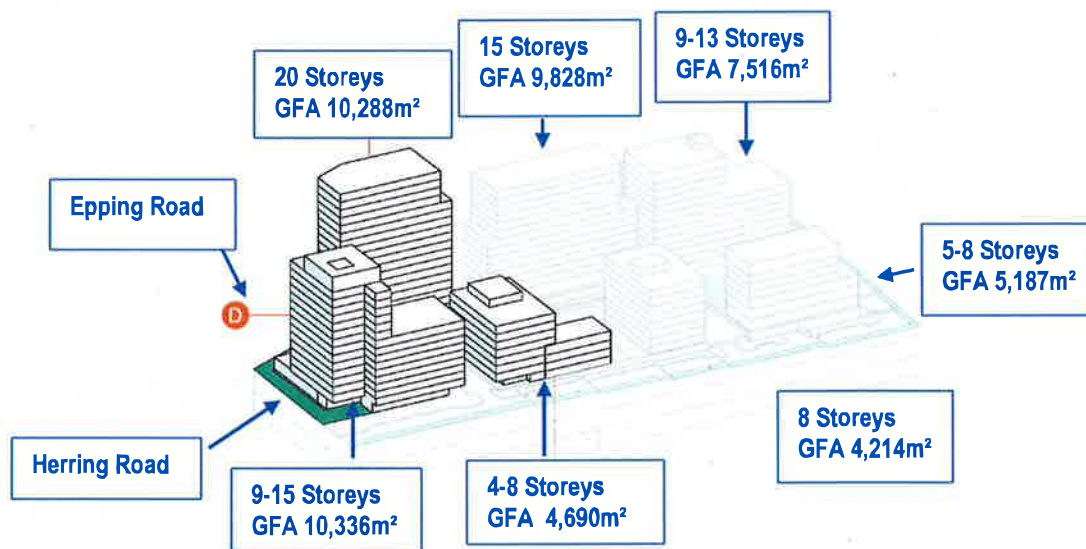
Concept approval sought for 7 Building Envelopes – Aerial view north east elevation
